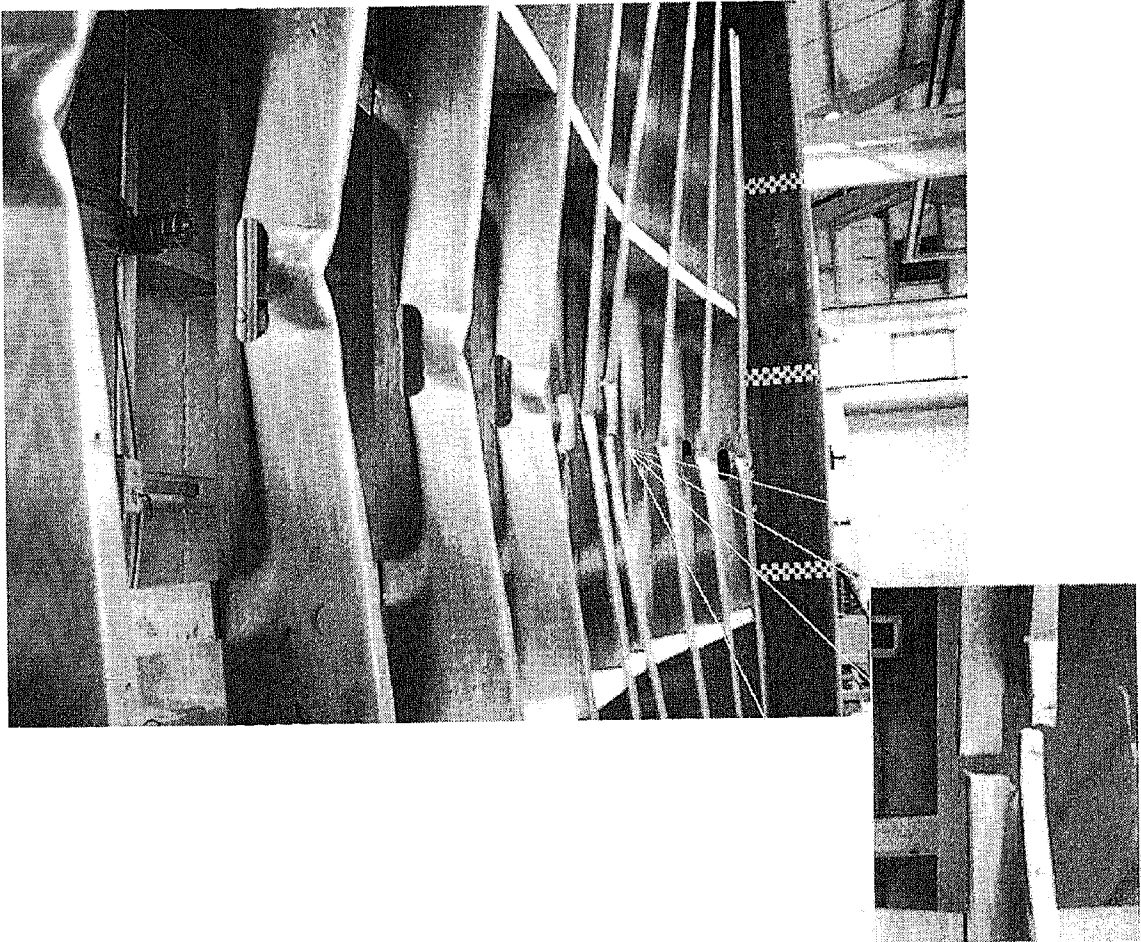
Failed Wall with Ruptured Steel Stud at Center Utility Hole
